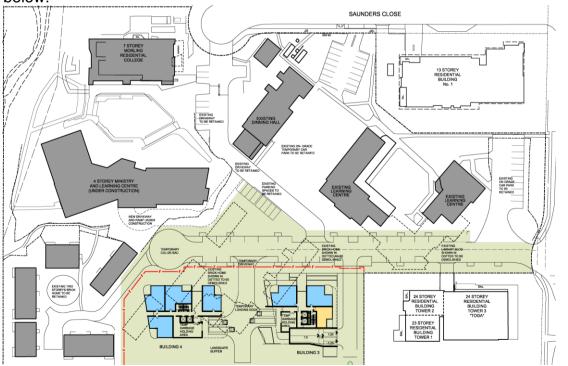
Scenario 2 – Construction of Building 3 & 4 with Road 3 three quarter completed.
